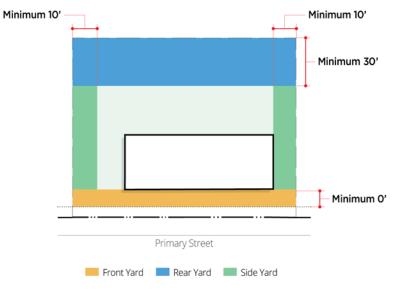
Large Lot Commercial Building Type Yard Setbacks
